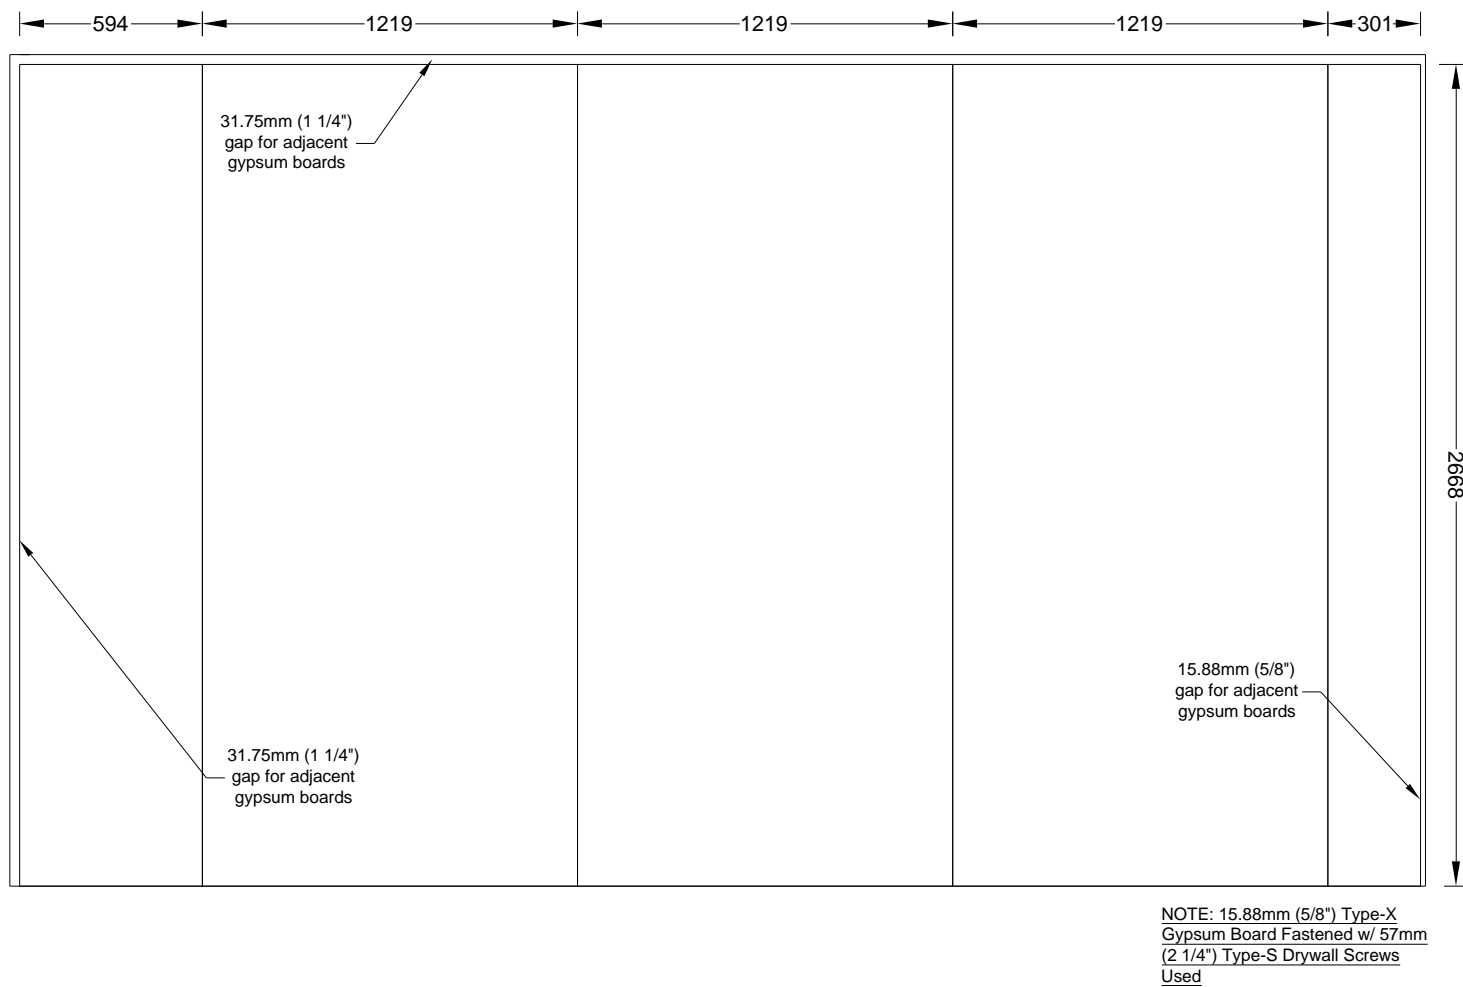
Test 1-6 Large Compartment CLT - W3 - Gypsum Layout - Face Layer
